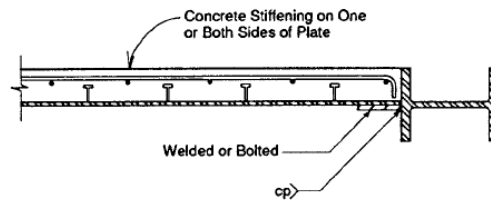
Concrete stiffened steel shear wall with steel boundary member.
